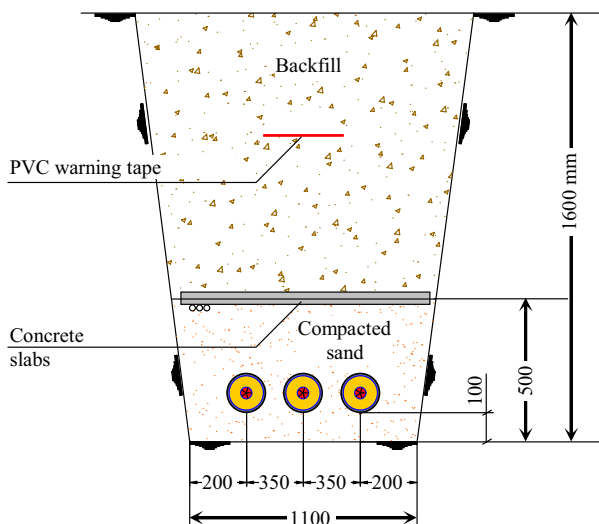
Standard cable laying in trench (Turbigio–Rho mixed line)
